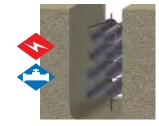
Stiffy Slab-on-Grade Double Column Trench Rack
